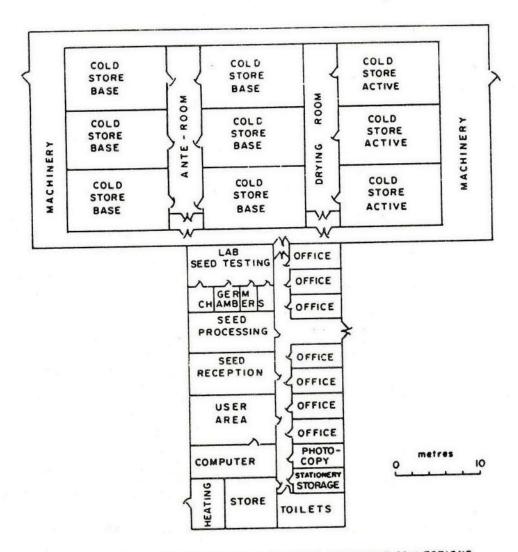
FLOOR PLAN OF GENE BANK WITH BASE AND ACTIVE COLLECTIONS
